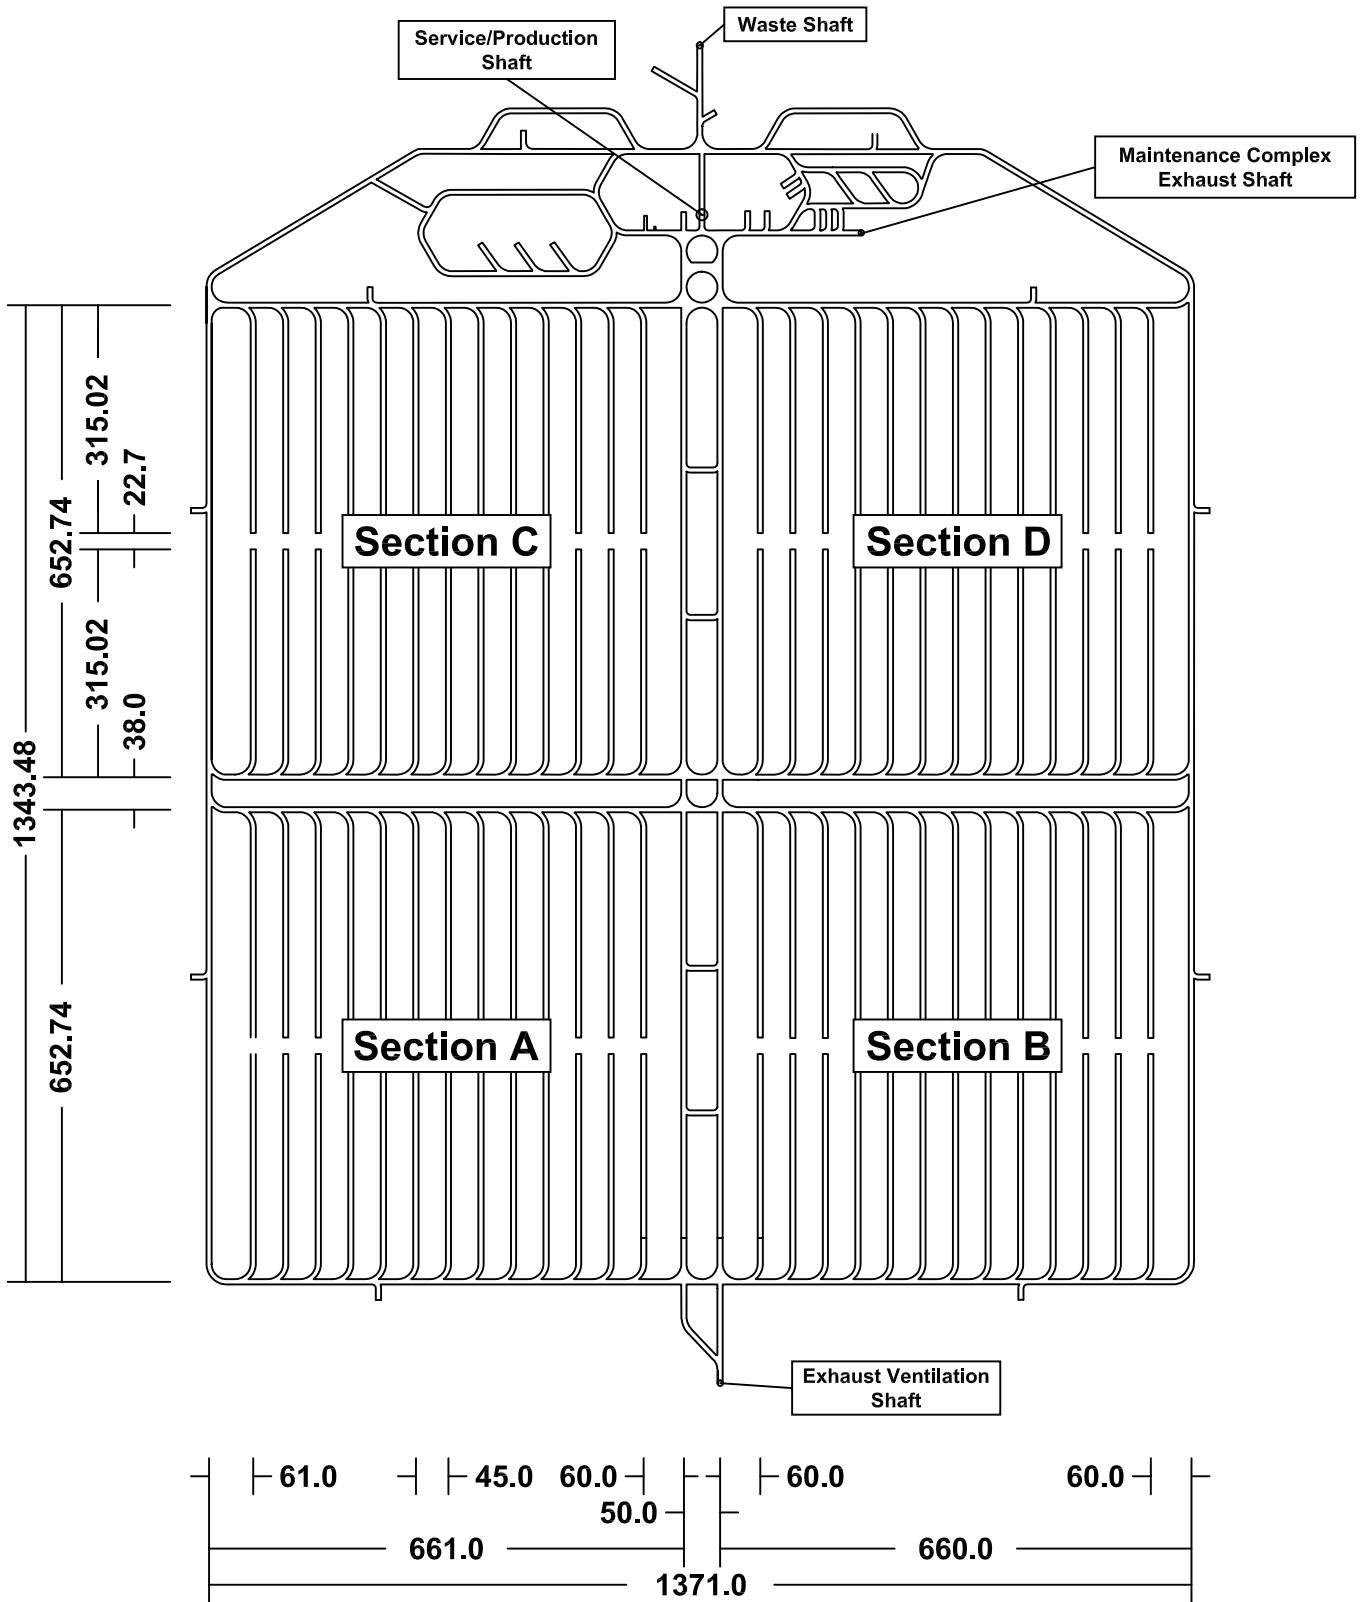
General Layout - Proposed Plan of Used Fuel Disposal Vault (Rev. 3)
